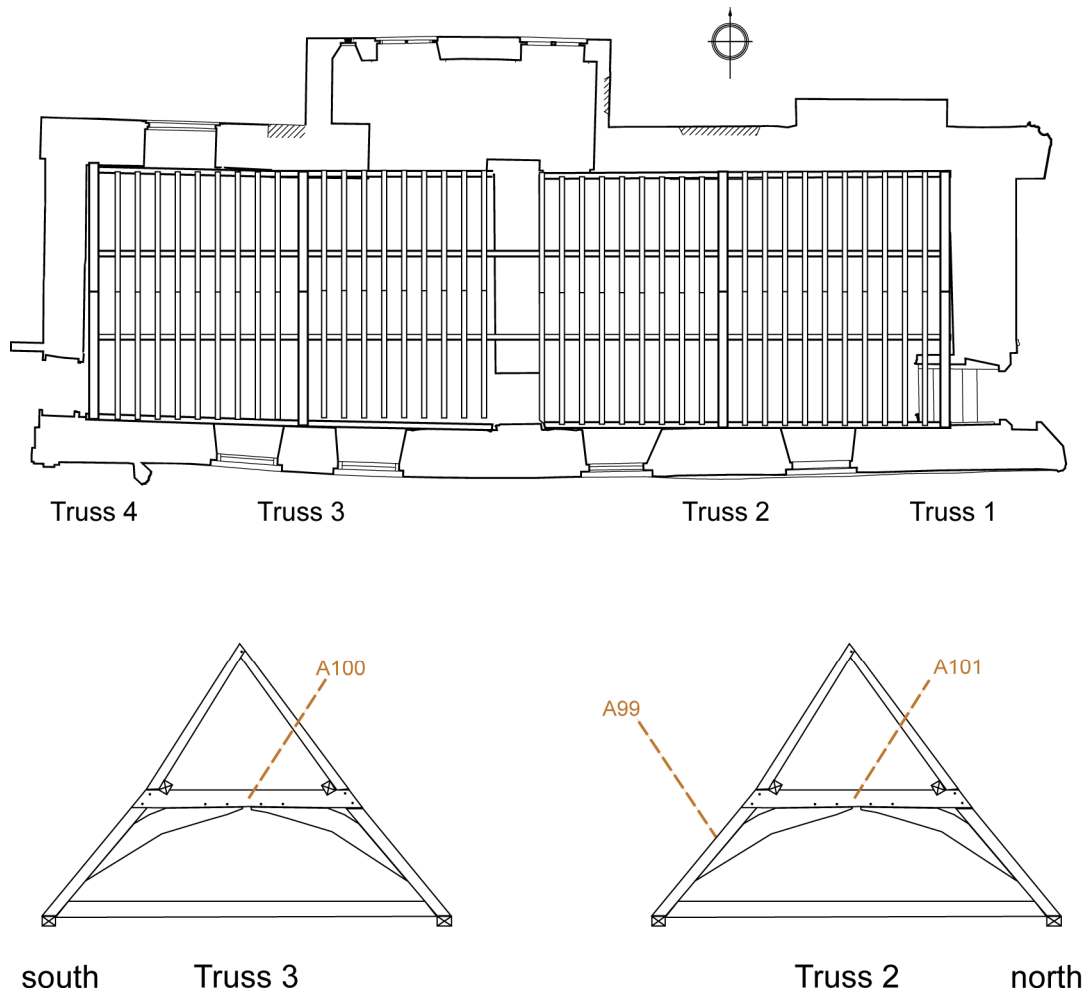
Roof timbers, rooms N2.16–21, showing the locations samples APT-A99–101
